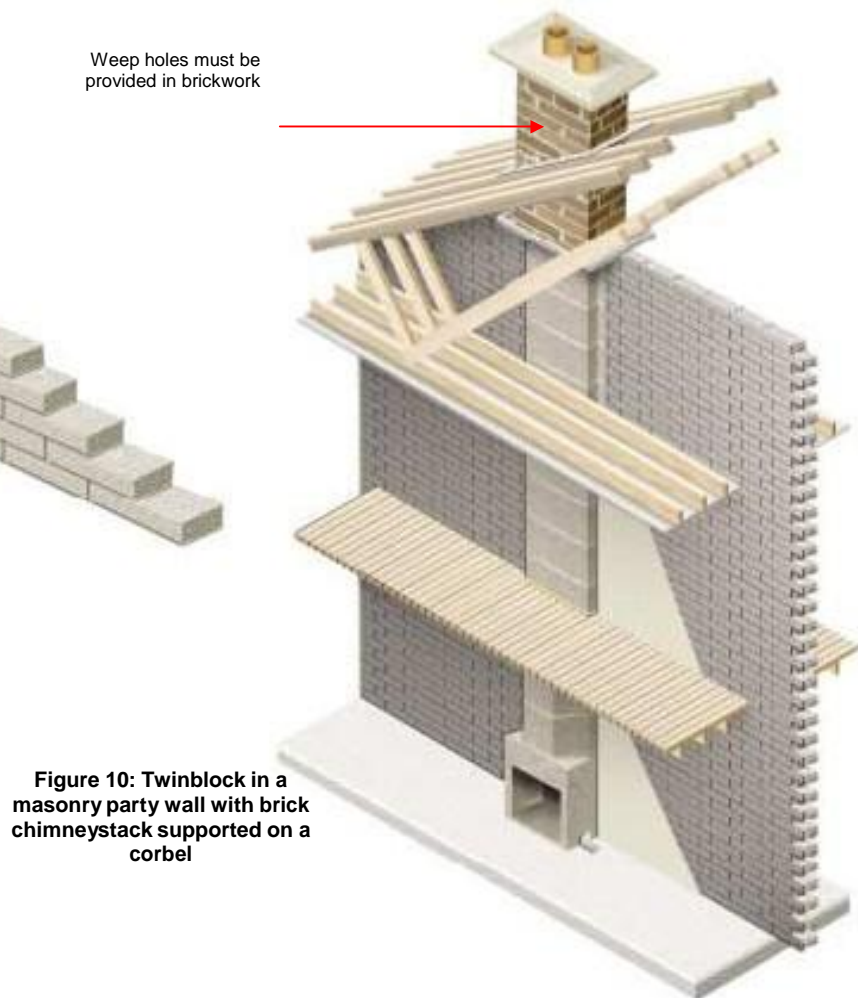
Twinblock in a masonry party wall with brick chimneystack supported on a corbel
